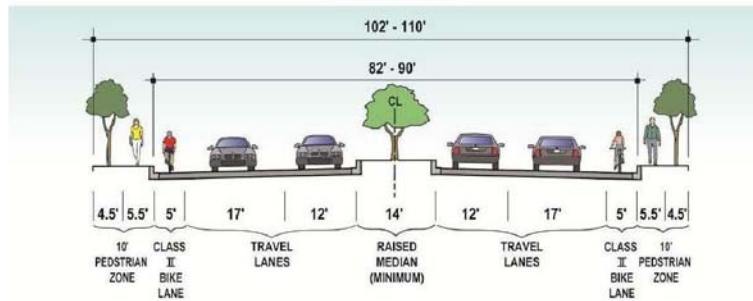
City of Escondido General Plan Roadway Profiles
